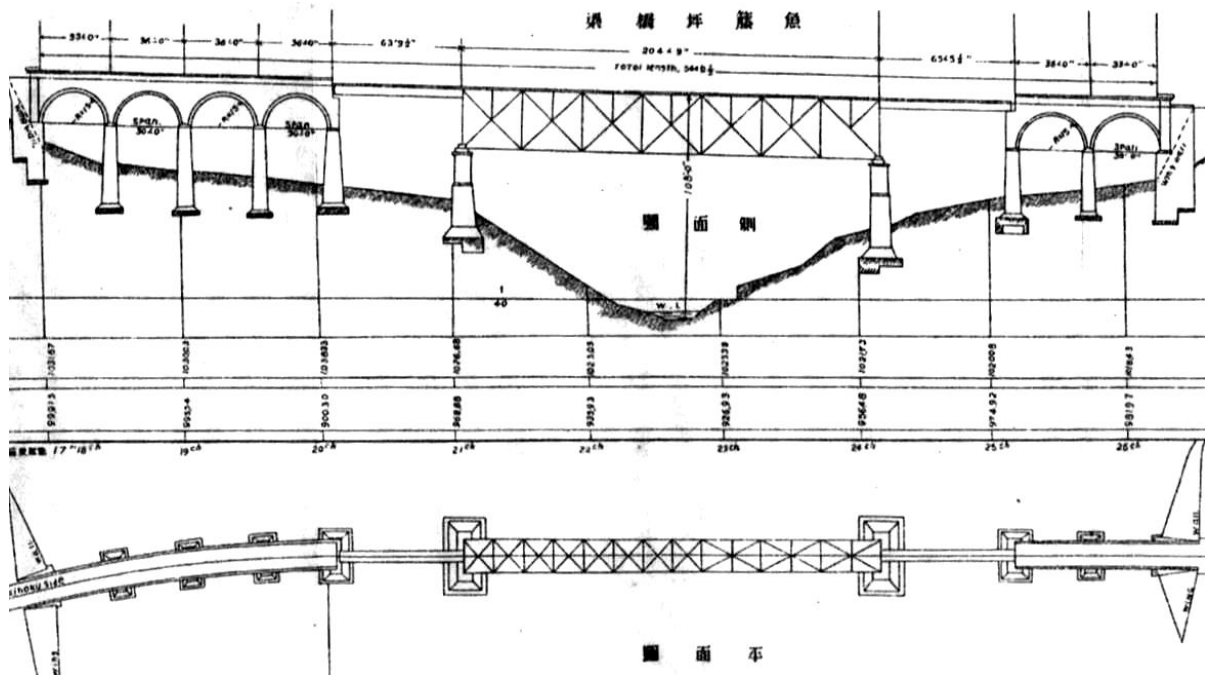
The design elevation and plan of Yutengping Bridge [1]
